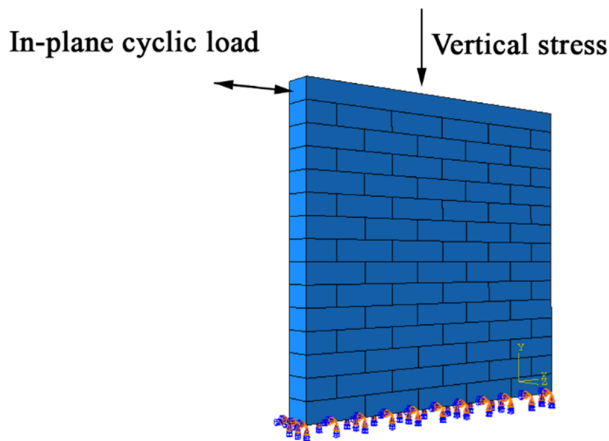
Masonry wall subjected to cyclic loading in the plane
